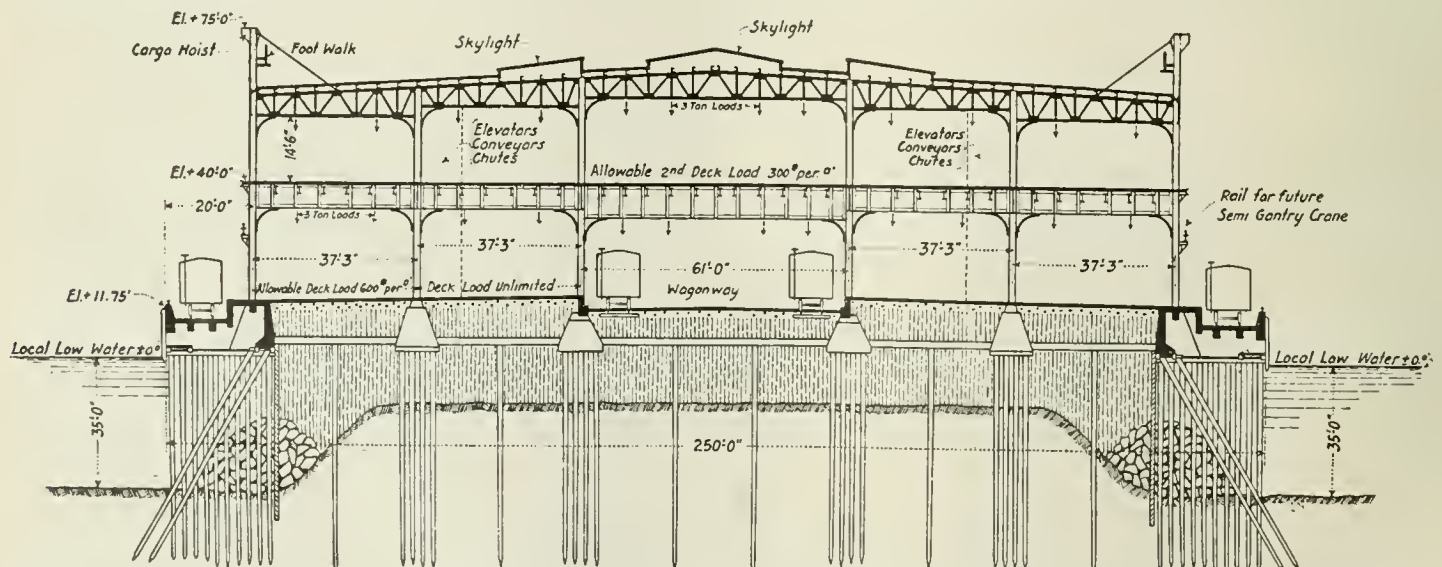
TYPICAL CROSS-SECTION OF MUNICIPAL PIER NO. 78, SOUTH WHARVES, PHILADELPHIA, SHOWING DEPRESSED APRON TRACKS, DEPRESSED CENTER TRACKS AND WAGONWAY; ALSO PROVISION FOR FUTURE INSTALLATION OF SEMI-GANTRY CRANES
